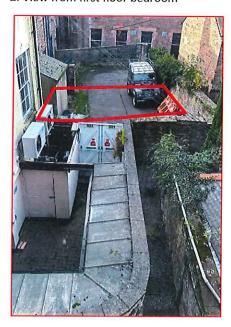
& 2 show the view from top and first floor bedroom towards the proposed
